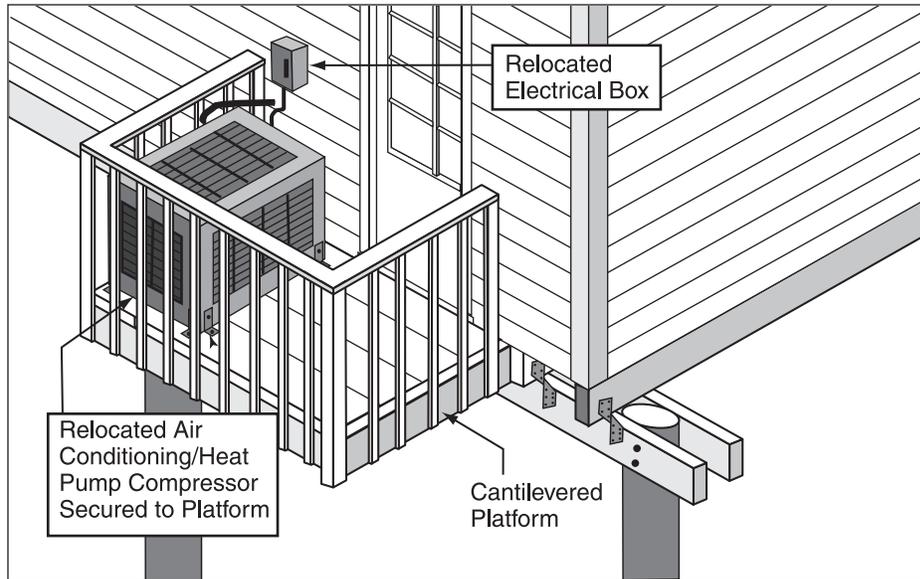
Air conditioning/heat pump compressor mounted on a cantilevered platform attached to a home elevated on an open foundation.
